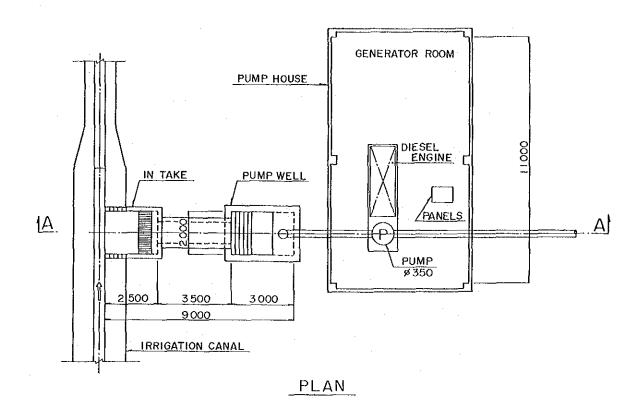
10 IRRIGATION SYSTEM PLAN (3)
